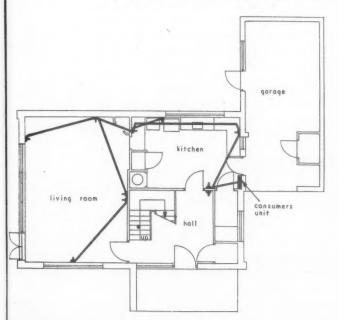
(left), cable routing for ground floor lighting excluding the living room.
